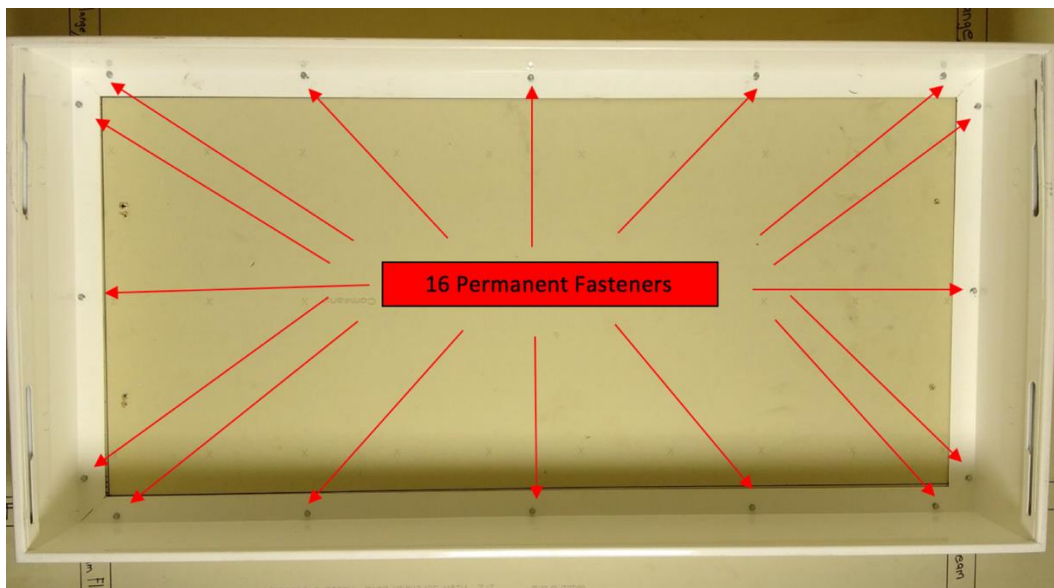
Finalizing the Hard Ceiling Mounting Box Installation
